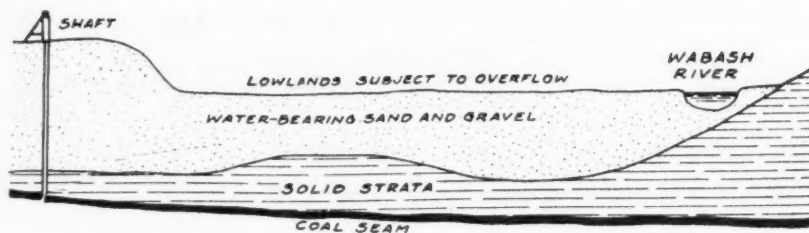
Cross-section over Saxton mine, Terre Haute, Ind.
